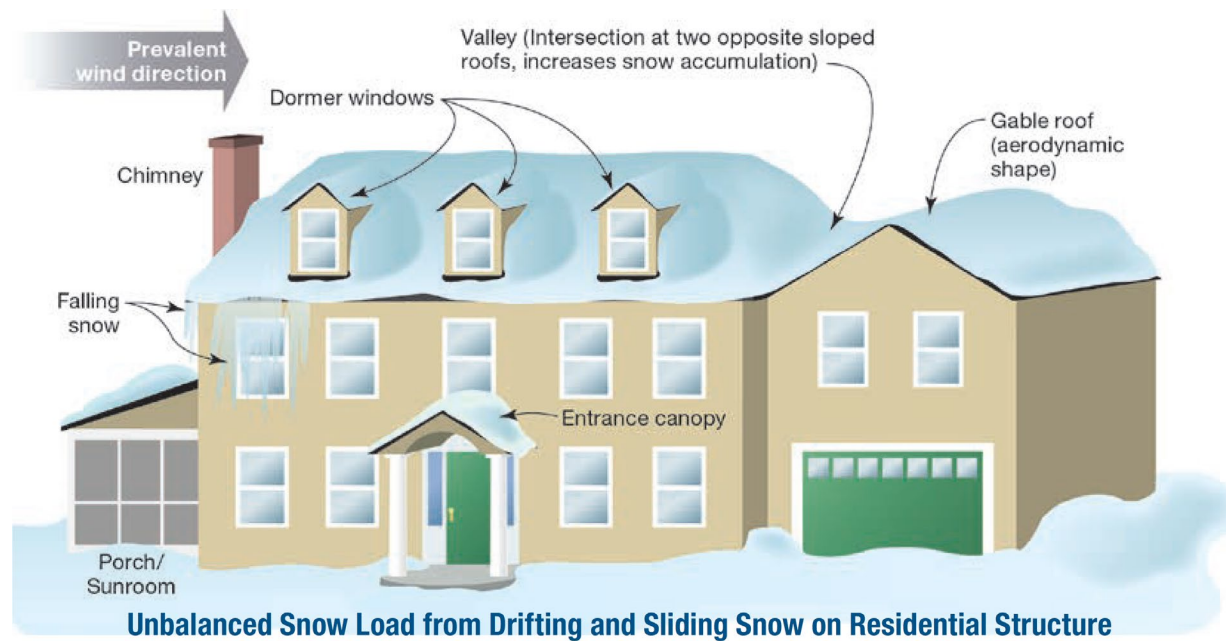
Illustration showing unbalanced snow load issues on a house.
